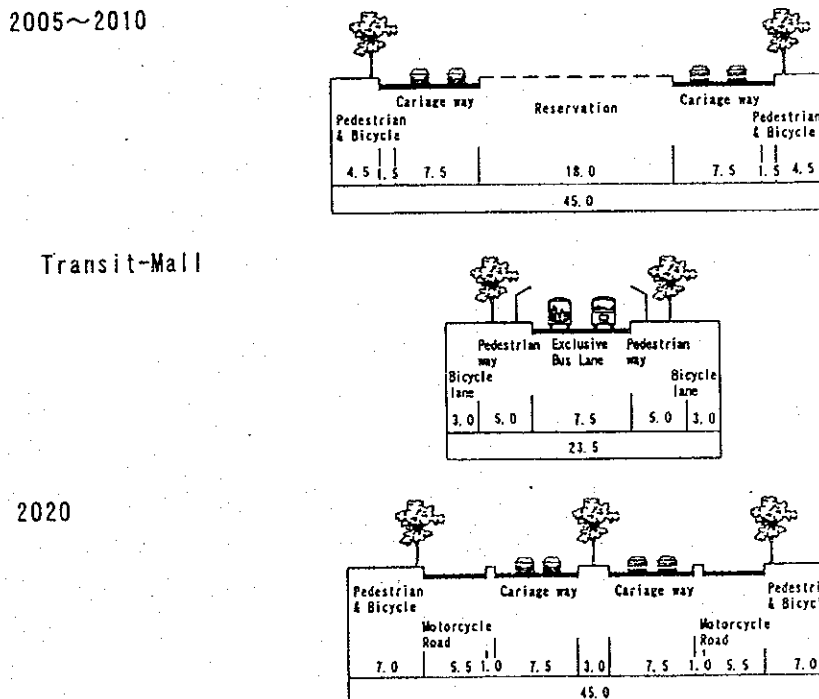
Typical Cross Section of Staged Development for Urban Arterial Road
